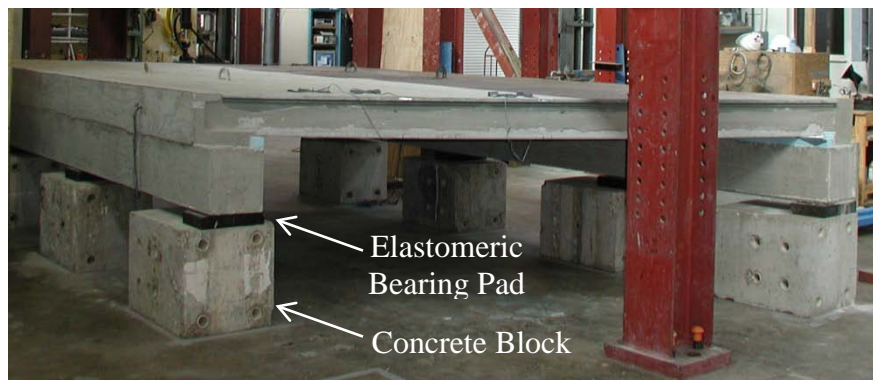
Configuration of Support Beams, Elastomeric Bearing Pads, and Concrete Blocks for Specimen P30P3
